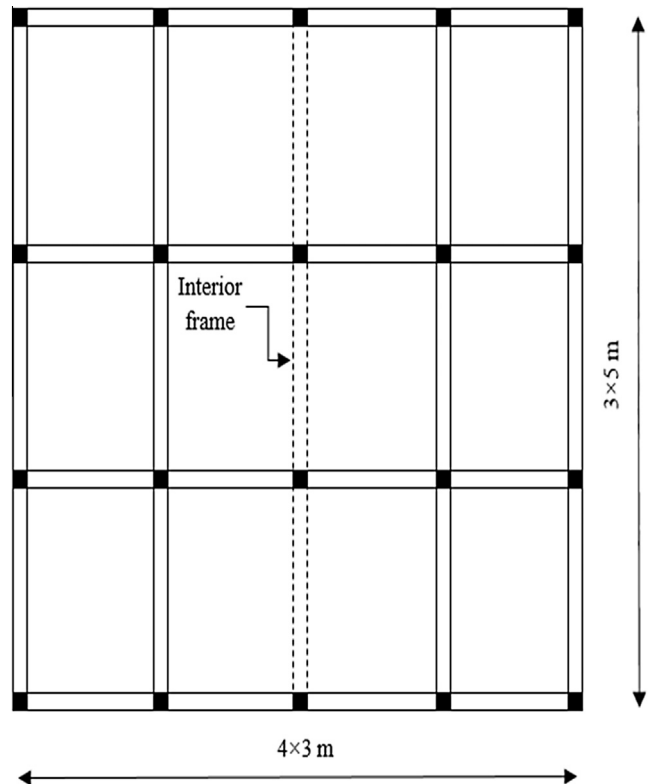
Floor plan of usual 5- and 8-storey reinforced concrete buildings.
